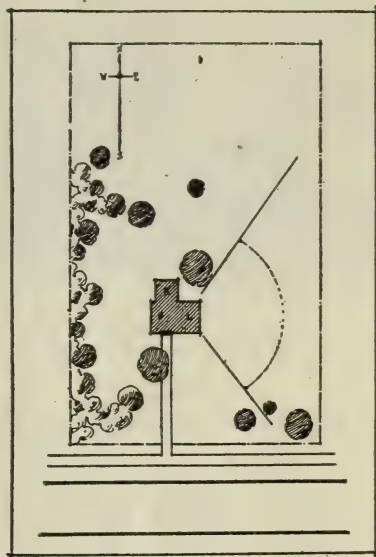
FIG. B — Planting plan to insure best effect of shade, outlook, protection, and privacy on a lot facing south
